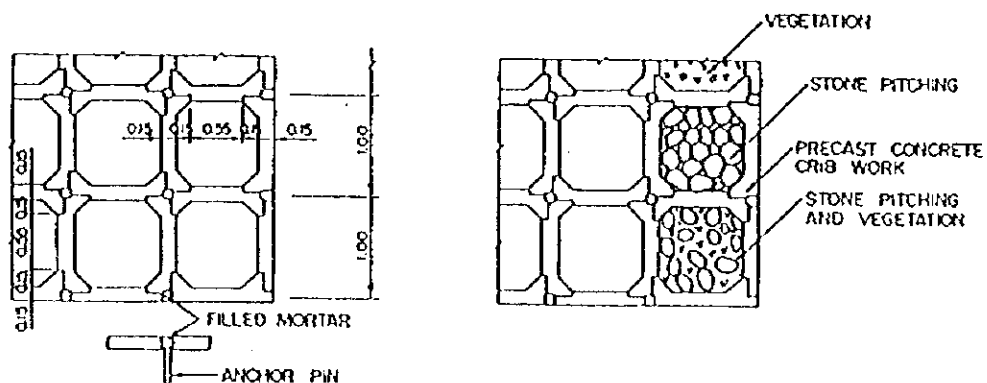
Sample of Precast Concrete Cribwork
